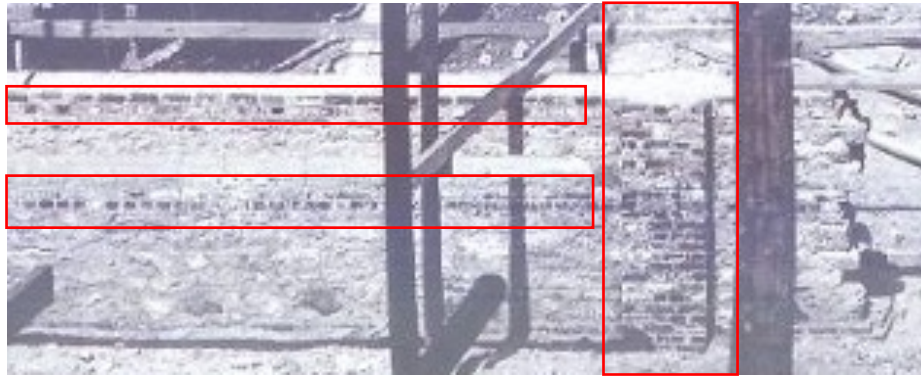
Detail from the left of Figure 171 show the brick beams and stone masonry in load bearing wall system of 3<sup>rd</sup> construction phase of IAM (source: Restitution Report of IAM prepared by *Seçkin Mimari Hizmetleri*, IDSM Archive)
